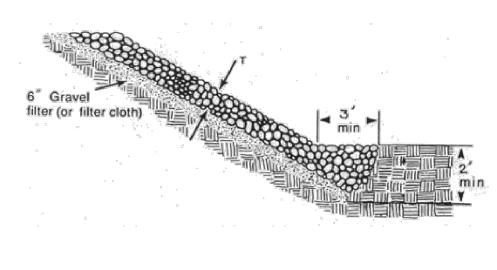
Typical Riprap Slope Protection Detail
